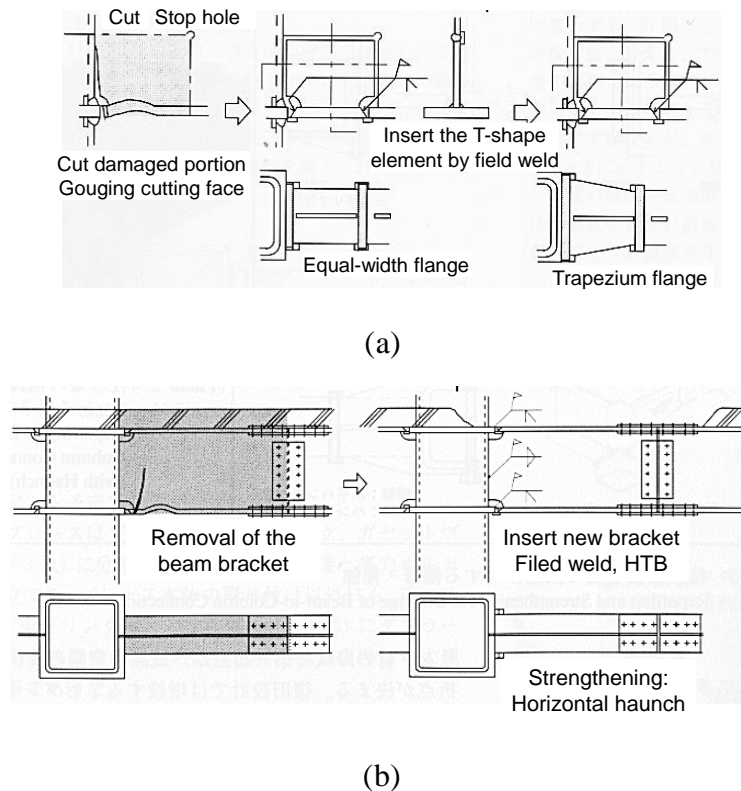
Some repair methods to connection: (a) Cut and replace the damaged web and beam flange; (b) Replace beam segment
